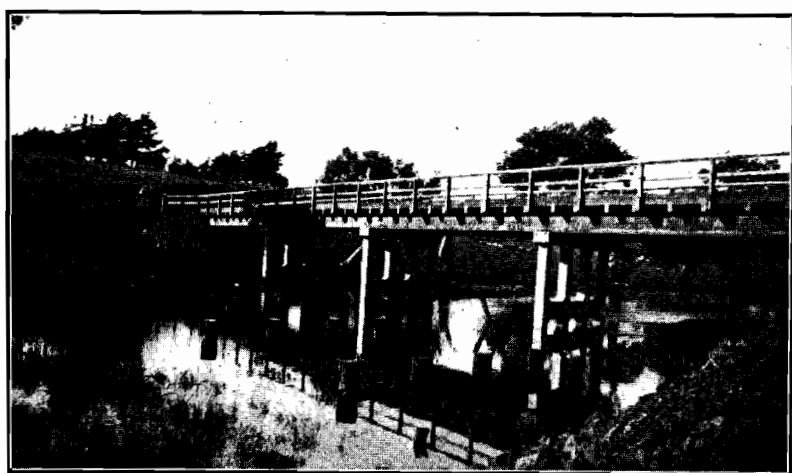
New bridge erected over Mount Emu Creek in the Shire of Hampden.
